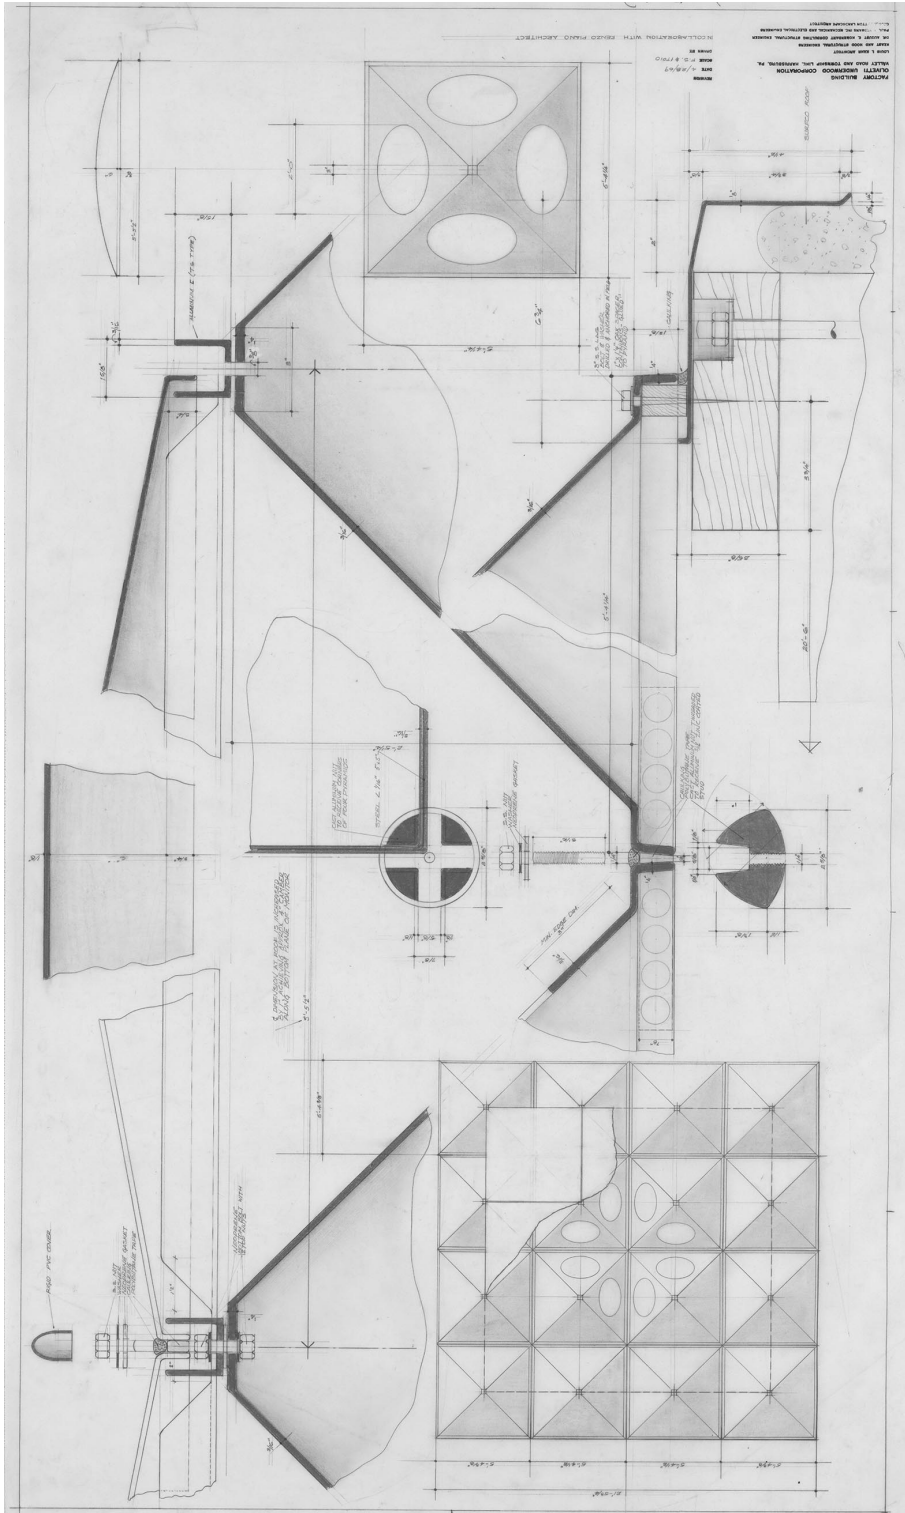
Plan, sections and details of the skylights of the Olivetti-Underwood factory, 1969. Renzo Piano. (Architectural Archives of the University of Pennsylvania)
